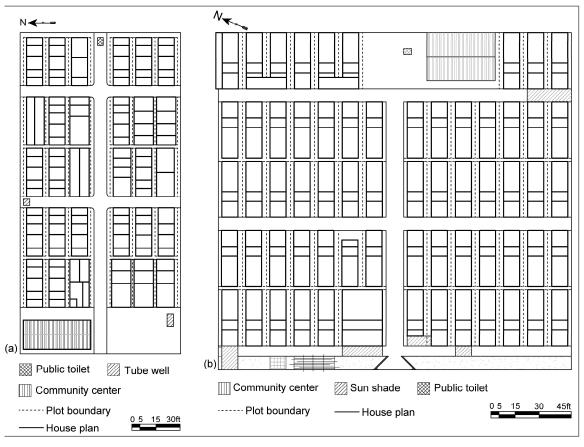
Site plan of study areas (a) site-1 and (b) site-2
